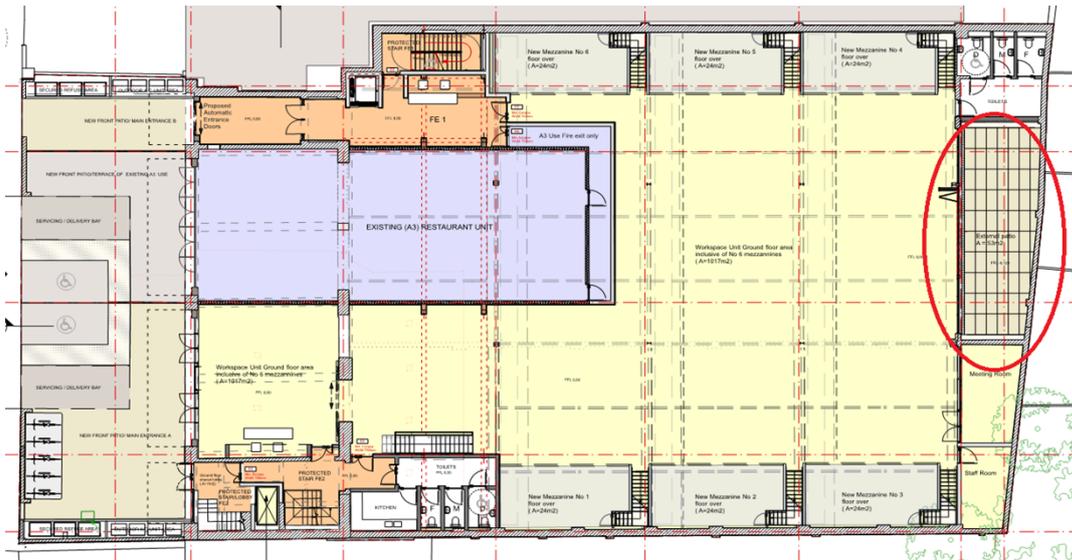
Proposed ground floor plan (the external patio area is highlighted in red)
